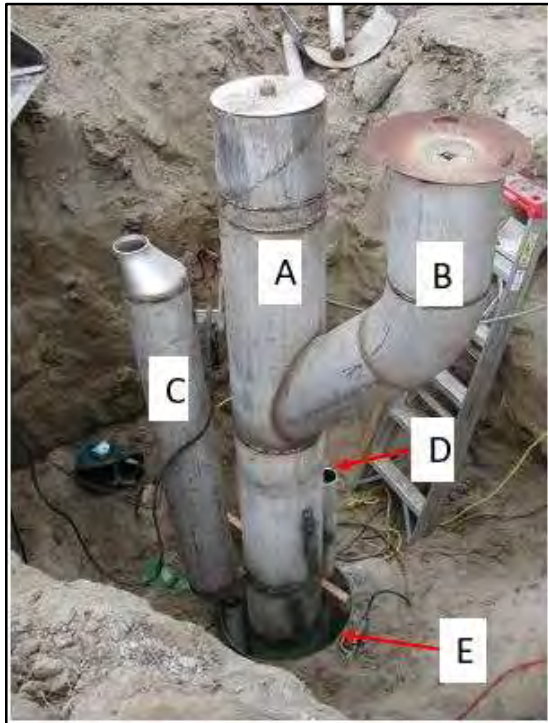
Modern Well well-head below ground surface. A 12-inch injection casing. B Backwash discharge piping. C 3-inch camera tube. Note the two eccentric reducers and pipe spool used to allow for the passage of long geophysical tools without getting stuck as the camera tube angles away from the injection casing. The top eccentric reducer is 4-inch, the lower eccentric reducer is 3-inch. This camera tube acts as an airline in most Modern Wells when backflushing. The camera tube acts a stilling well and houses the LIT while injecting. D 3-inch gravel feed tube. This tube contains two 11.5° bends (not visible in image) to clear well-head equipment at the surface. E Conductor casing.
